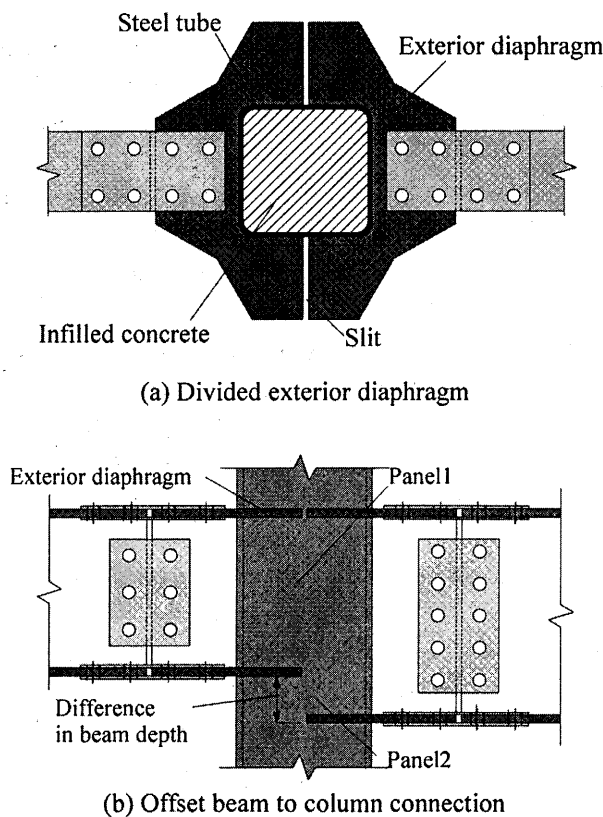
Offset H-shaped steel beam to square CFT column connection with exterior diaphragms
